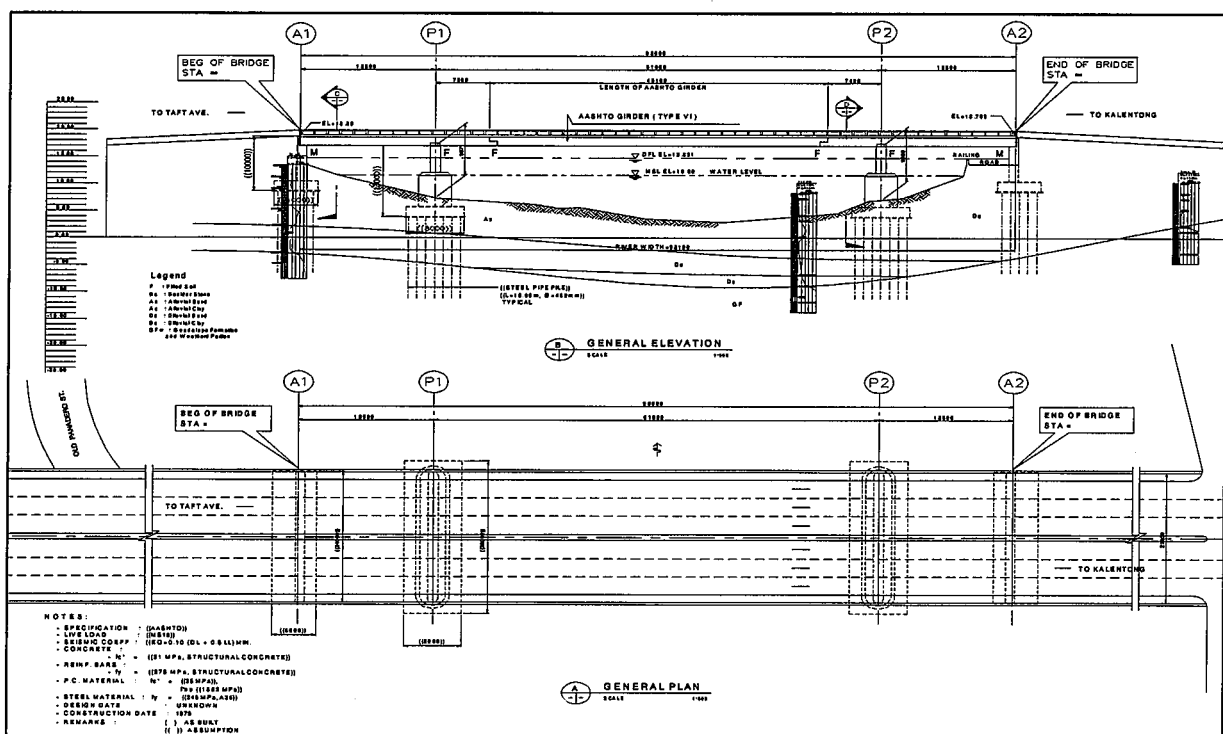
An Example of Analyzed Assumption of Original Structural Design (Lambingan Bridge)
